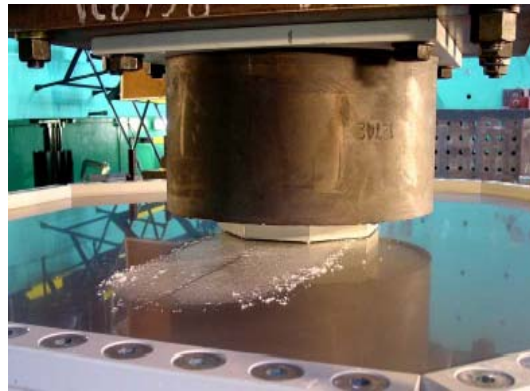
A common type of Hybrid bearing consisting of a laminated rubber bearing and a sliding bearing
